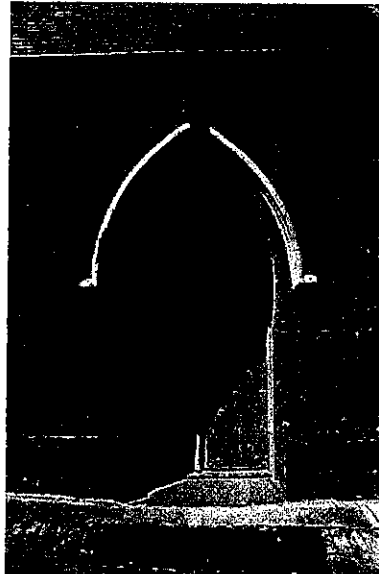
Exterior, north elevation. Detail of porch door opening and doors. Note the delamination of the rendered label mould.
